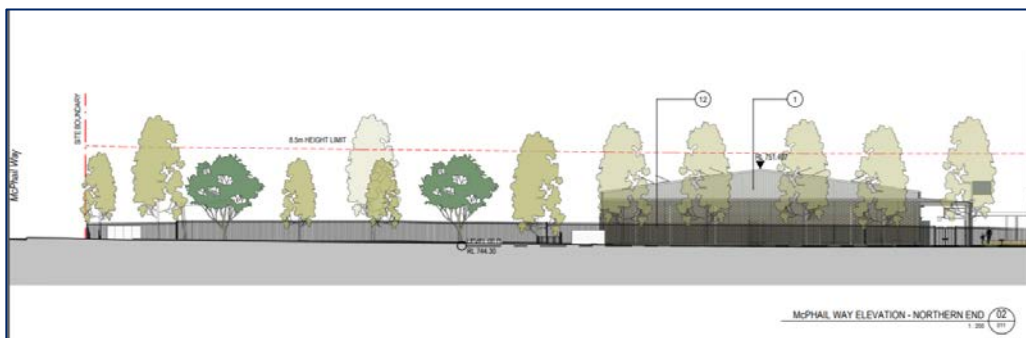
| North western elevation (McPhail Way) (Source: Applicant's RtS 2021)
